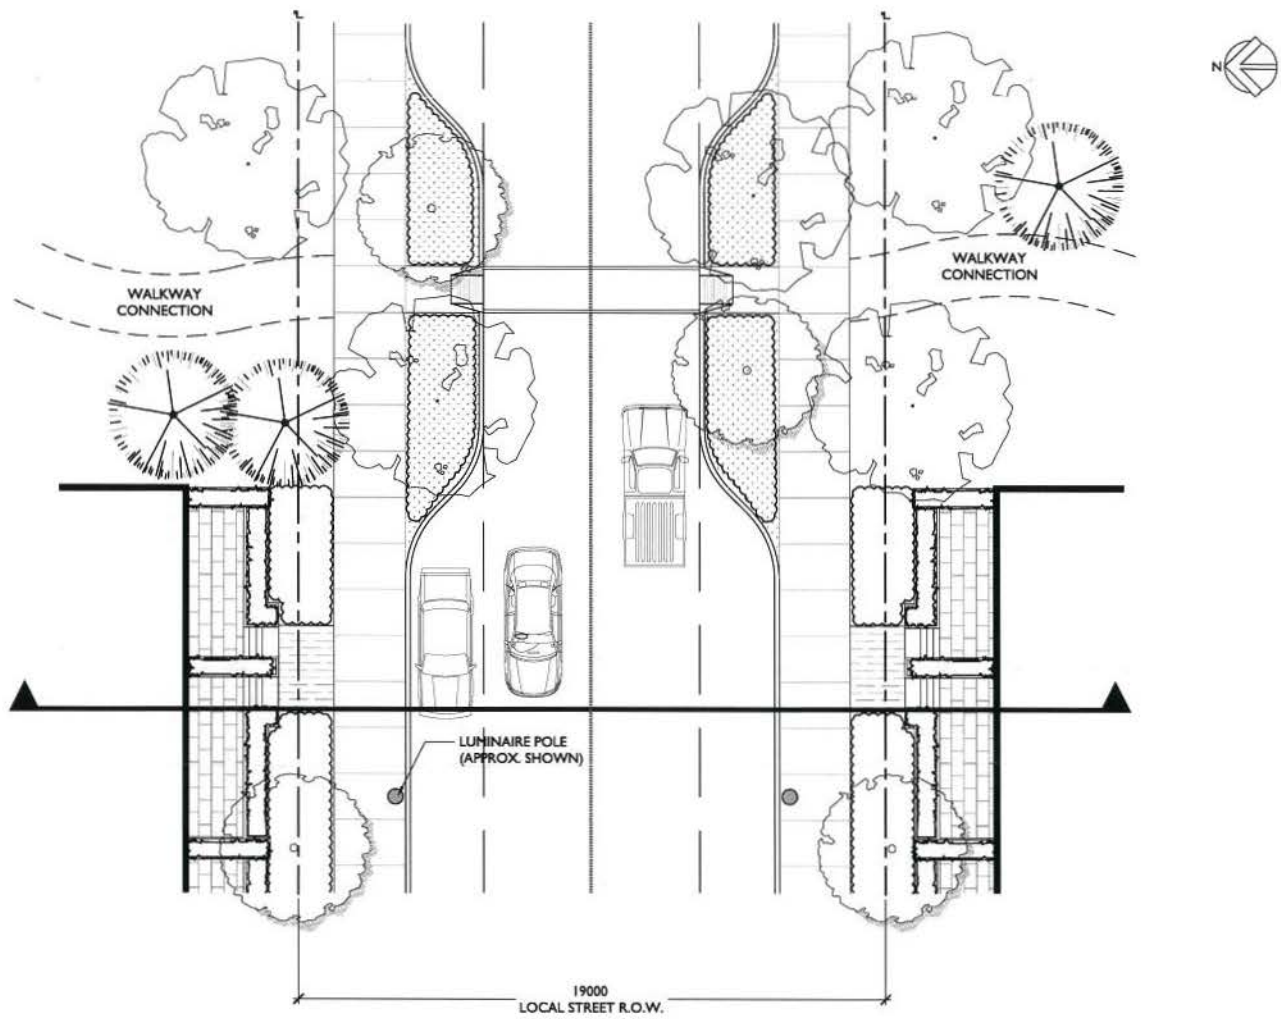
Crown Street Cross Section - West of Mountain Highway
